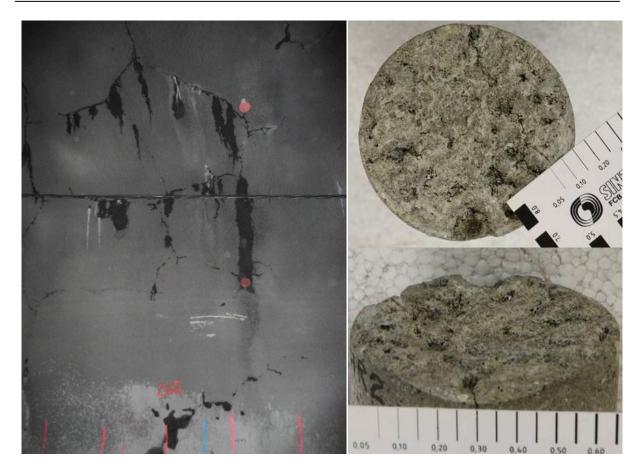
Left photo: Cracking of sprayed concrete visible as dark lines from water ingress, in rock support sprayed concrete in the research section of the Ulvin access tunnel. The red lines in the lower part indicate 1 m spacing. Right: Detailed crack images showing the use of a crack measuring gauge on a sprayed concrete sample from the rock support lining in the Gevingås rail tunnel. The core diameter is 76 mm [1]
